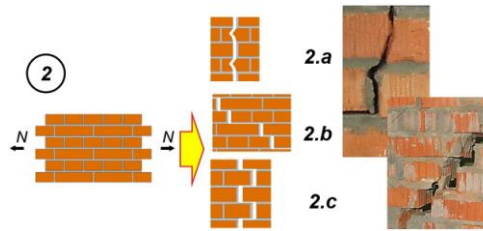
Clay brick masonry destruction pattern under tensile strains acting parallel to horizontal masonry joint
